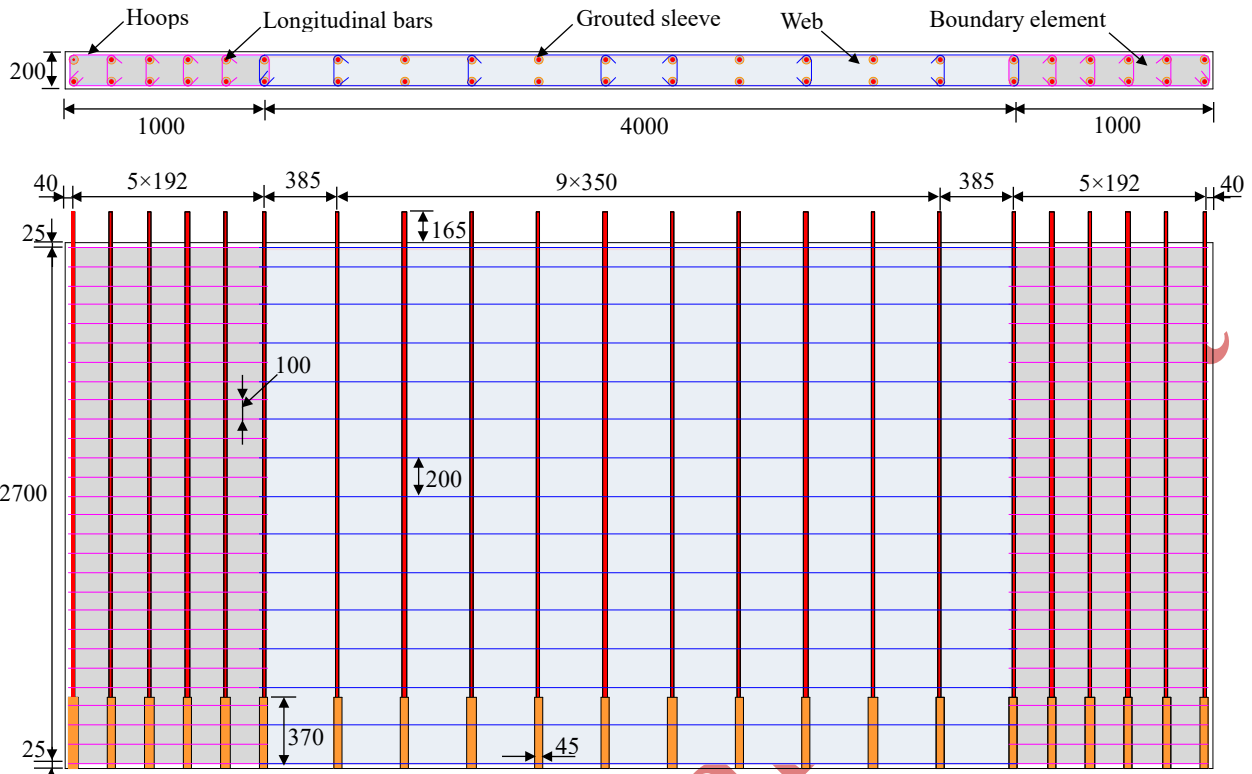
Major design details of a structural wall of concrete modules (unit: mm)
